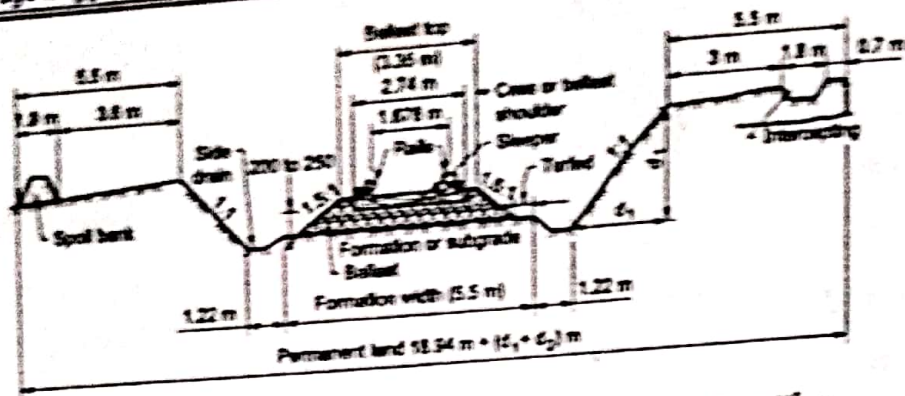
Cross-section of a single broad gauge track in cutting
